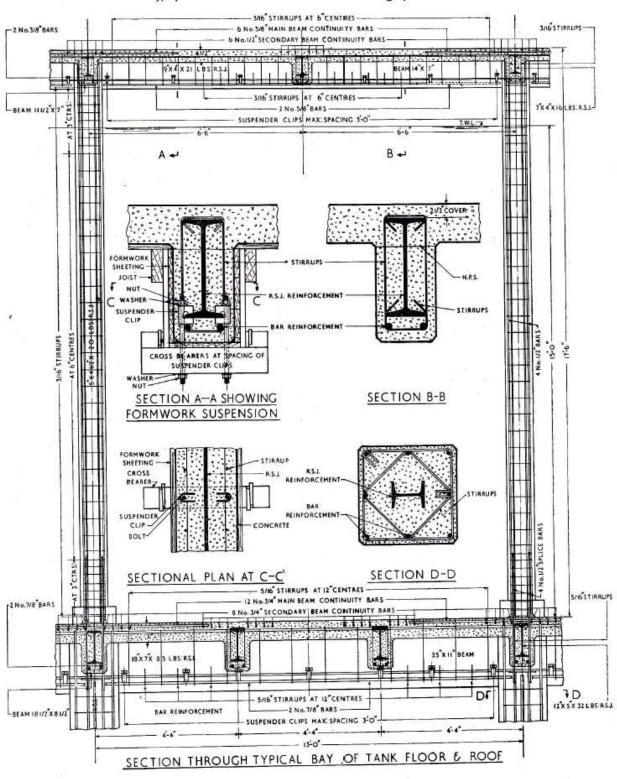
Reinforced Steelwork used in Water Tower Tank Floors and Roofs
